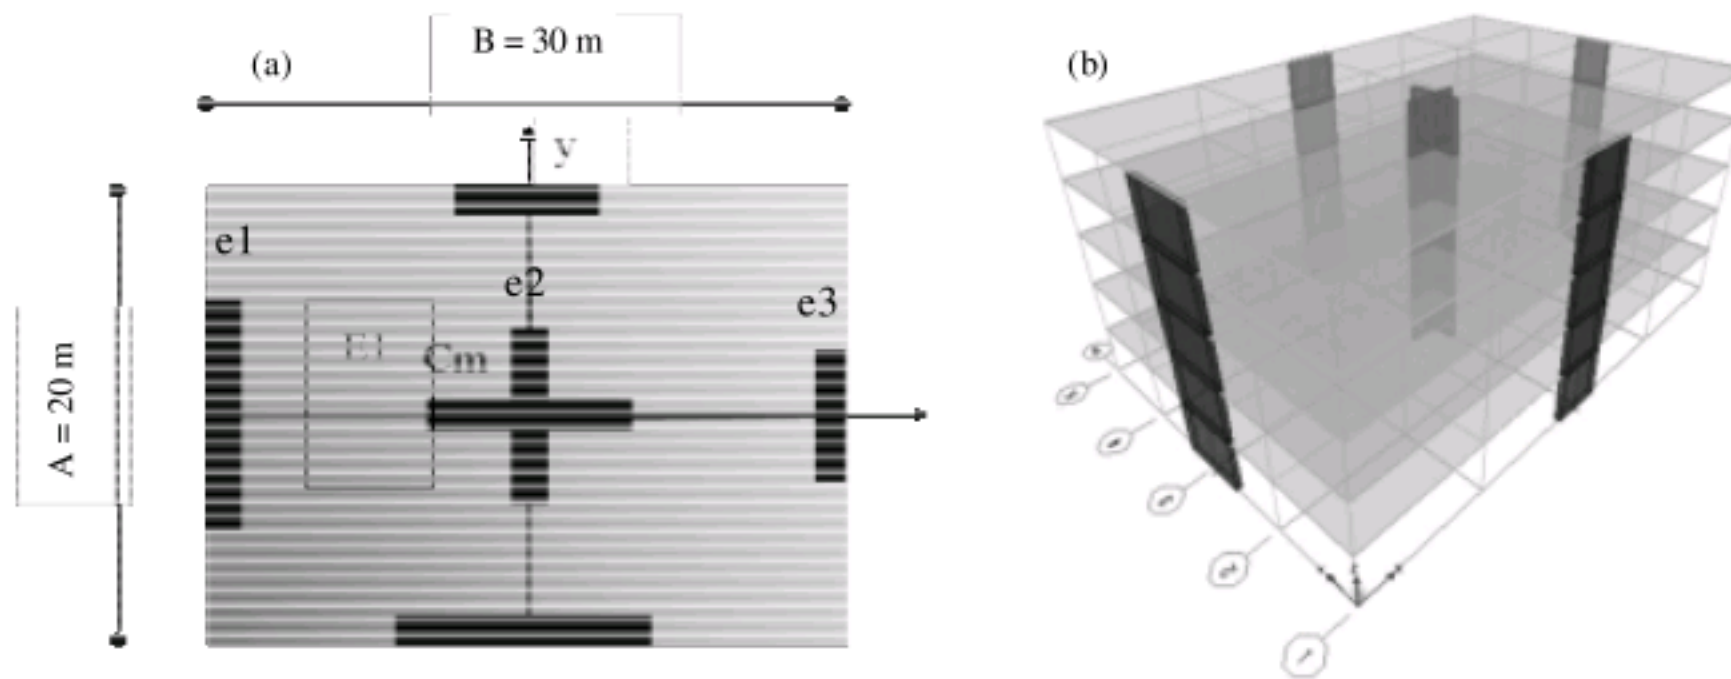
(a) Plan and (b) 3D view of a TU building model
